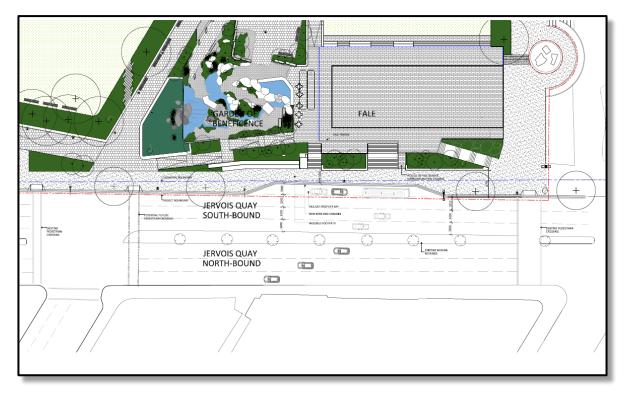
On-street Loading and Parking Area. (Source: Wraight + Associates)
